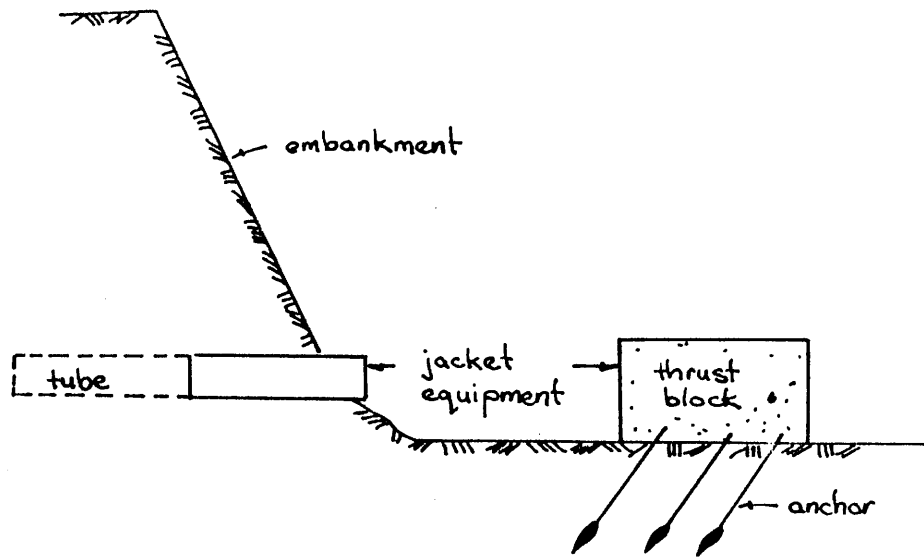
ANCHOR ARRANGEMENT TO PROVIDE A REACTION FOR PIPE JACKING.
